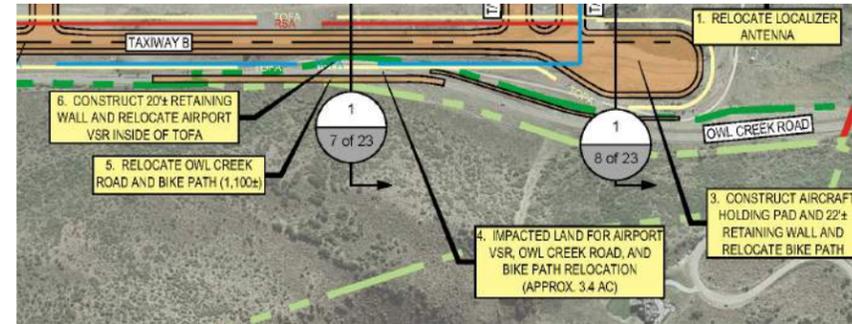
East Side Impacts (Appendix D, Alternative 13, Sheet 1 of 27)
